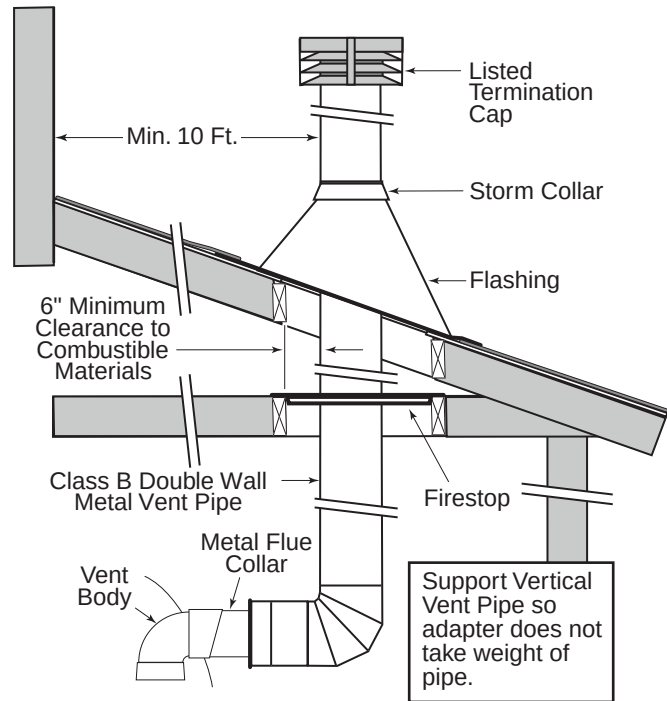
Typical Metal Vent Pipe Installation - U.S.
